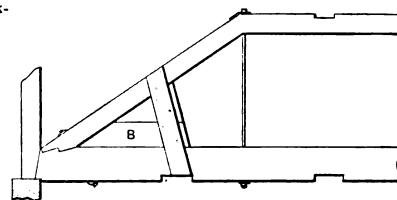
Detail of Truss, Showing Method of Stiffening as
